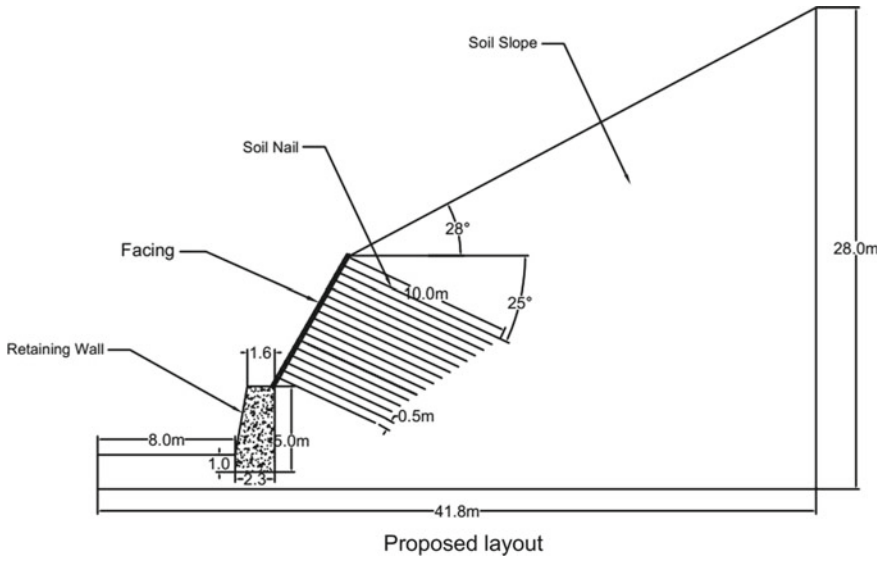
Final proposed profile of stabilized soil slope at Ch-600
